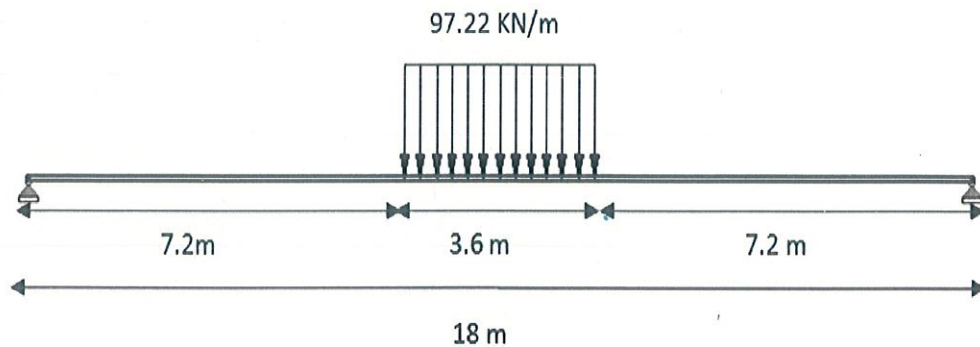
DEAD LOADS ON PLATE GIRDER
